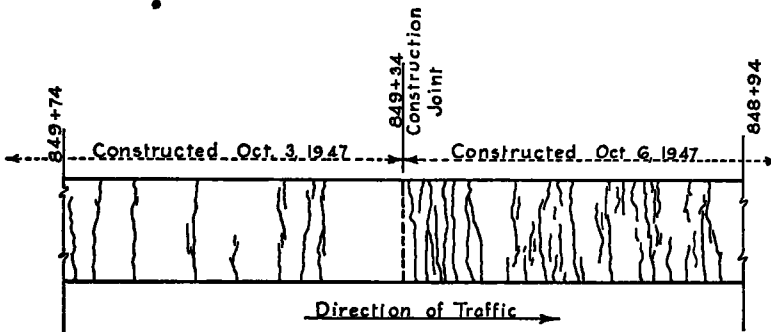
Crack Pattern—8-in. Section—Outside Lane—Nov. 1950
